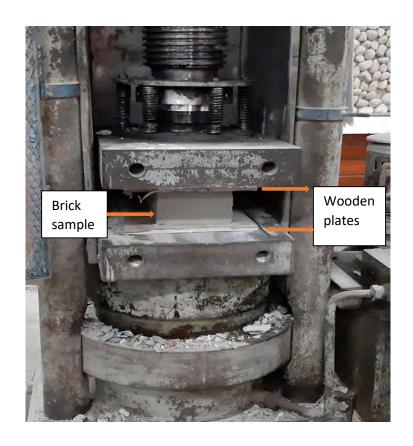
Arrangement of brick sample inside Macklow-Smith Ltd. machine
